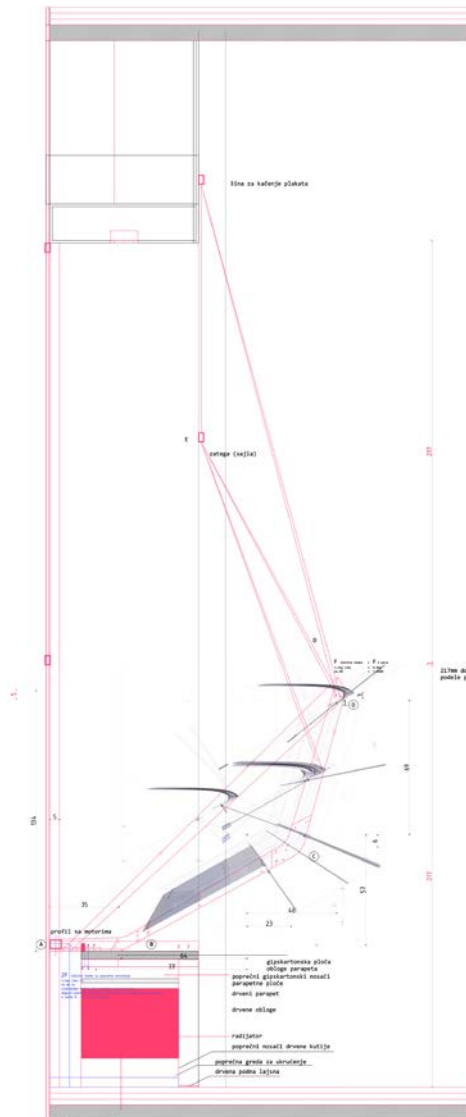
Drawing and diagram of architectural and structural analysis (simplified construction and static scheme and cross-section superimposed with the perspective section-view from the 3d model) of the proposed spatial configuration and its final form designed for the staging at the *Gallery of Science and Technology*, SANU Belgrade, 4-16 December 2019, Exhibition *On Architecture 2019*, Author: Dragana Ćirić (Curator: Ružica Bogdanović, STRAND).
